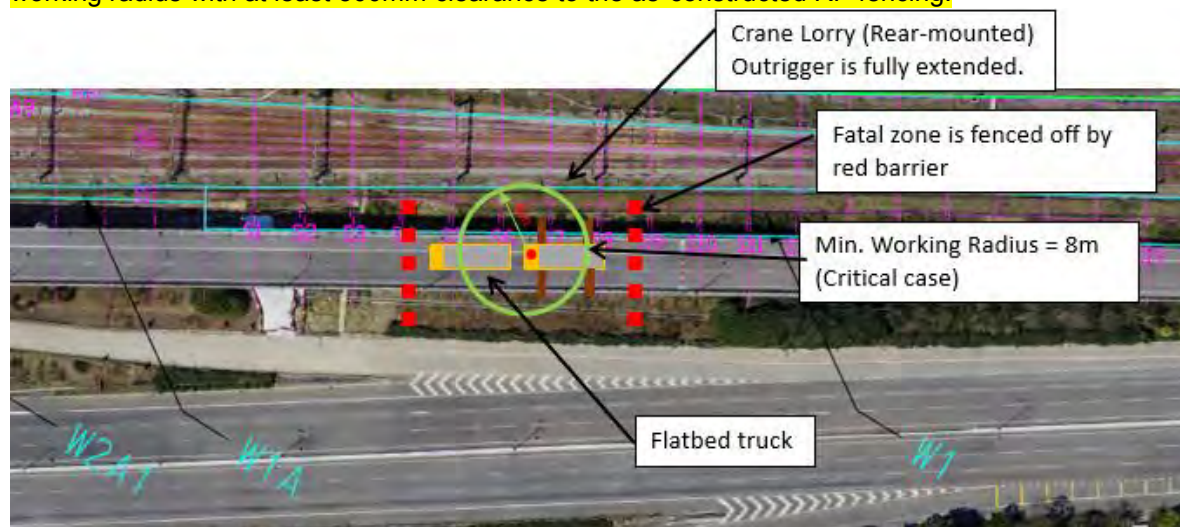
Site Set up and Logistic Arrangement during Foundation Stage (Access Road Level)
